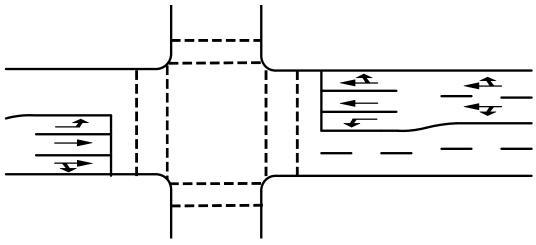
Typical Left Turn Lane on Intersection Approach
